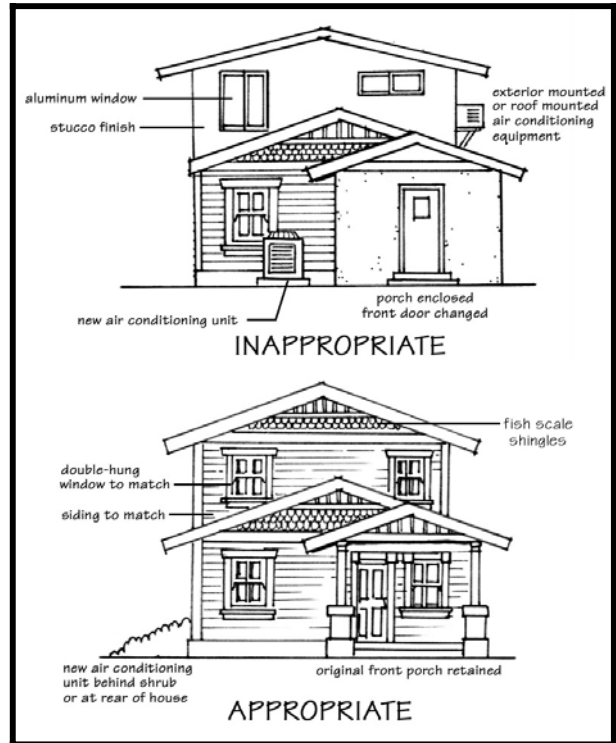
Addition should incorporate the distinctive design features of the original building
